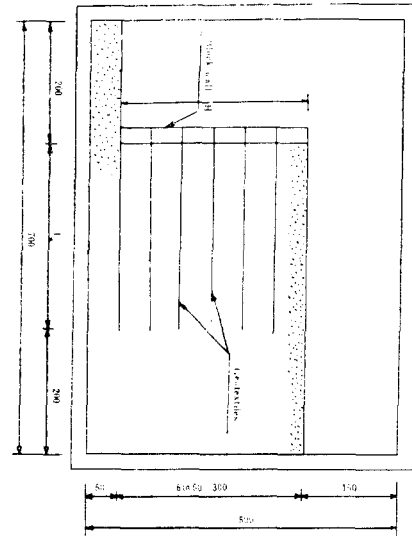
Model test apparatus of geotextile reinforced earth masonry walls(mm)
